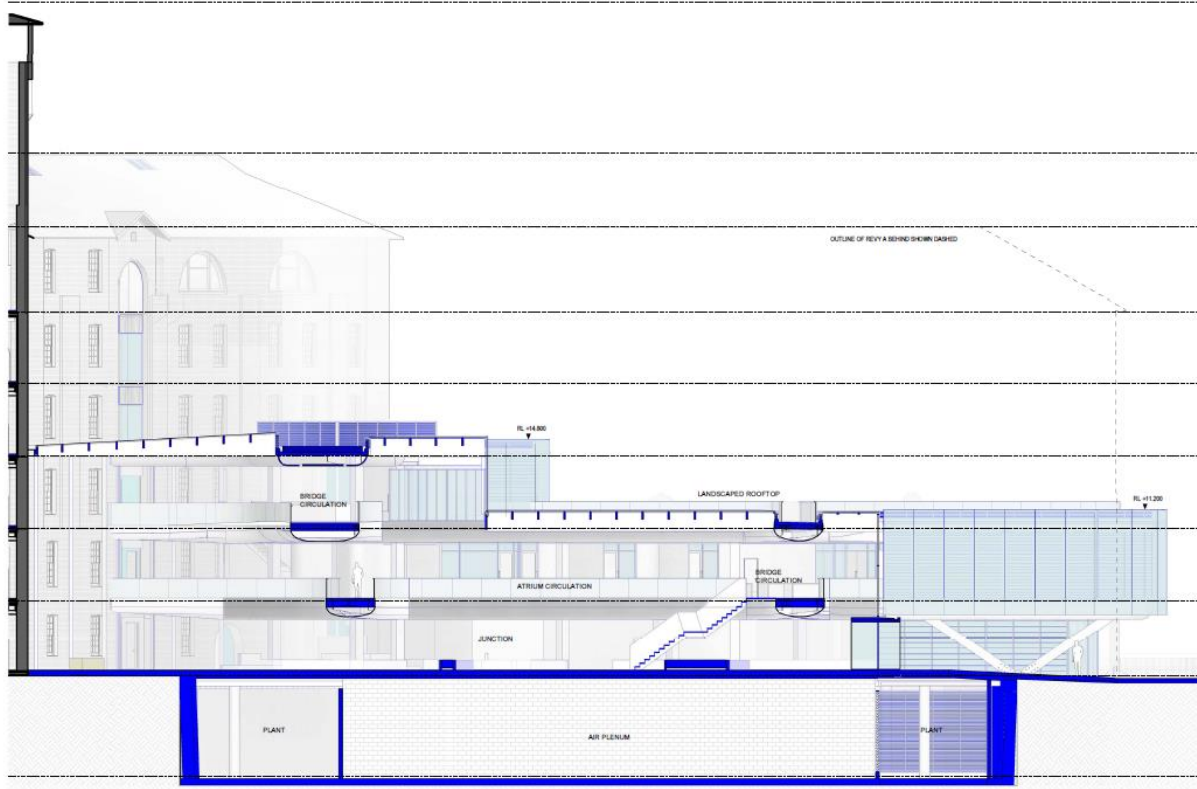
Section plan through REVY B and Building F (new works shown in blue)
